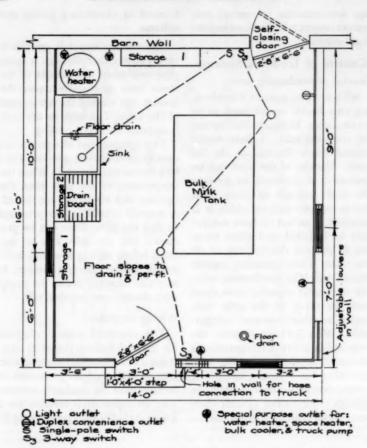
Floor plan of a milkhouse, showing location of milk tank and electric outlets
